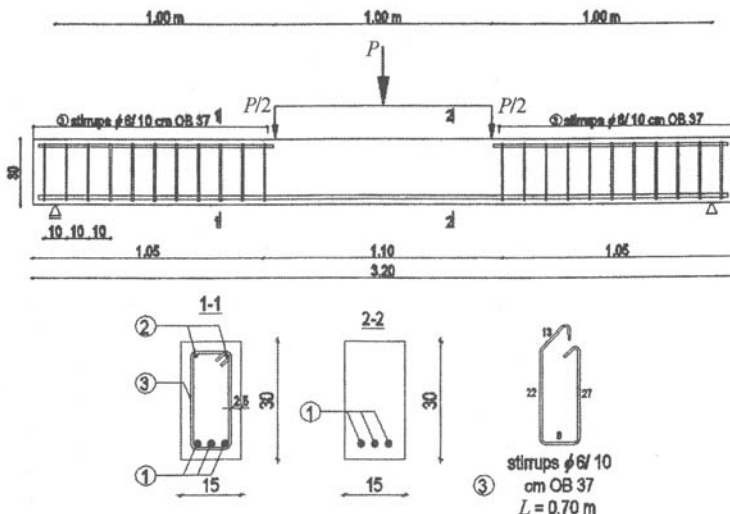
Beam internal reinforcement layout; application of forces; characteristic cross-sections.
